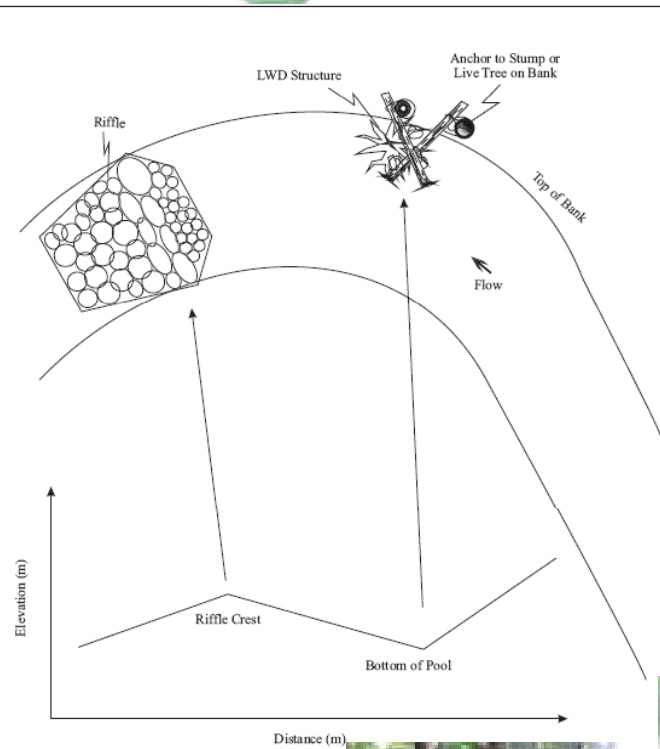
Typical LWD Jam Structure, Plan and Cross Section.
